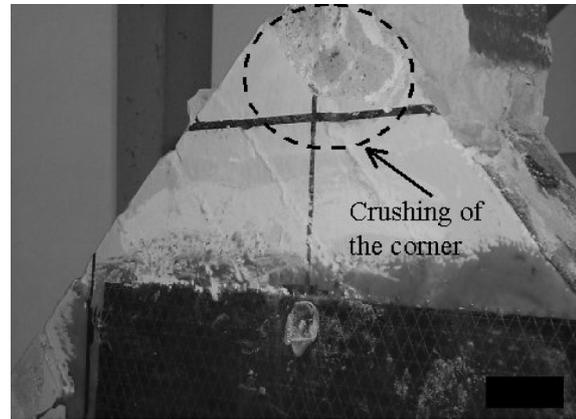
Failure pattern for the masonry walls strengthened with RFC and RFW composites
